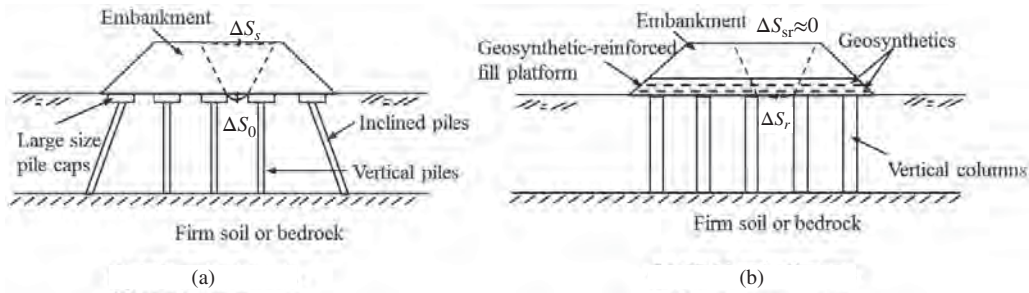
Column/pile-supported embankments: (a) CPS and (b) GRCS embankments.
